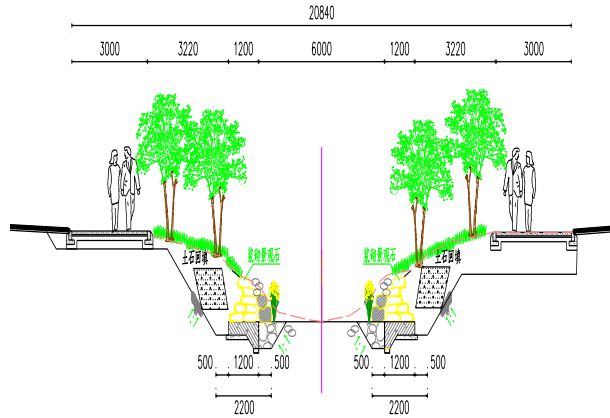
Proposed Cross Section of Tuqiao River and Shita River (Changshou)
